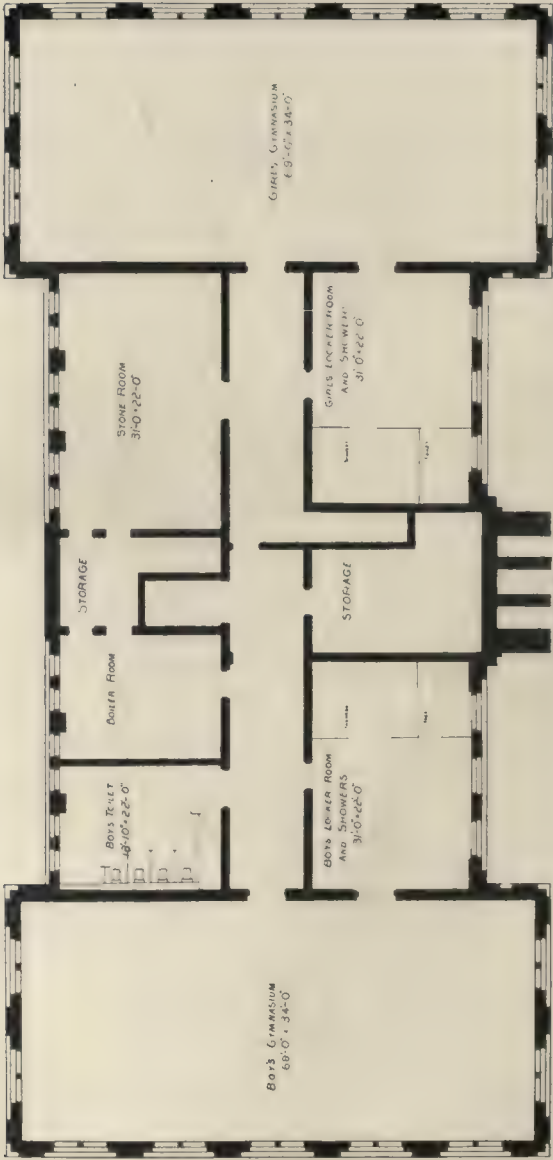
PLAN OF BASEMENT—PHYSICAL TRAINING DEPARTMENT.
